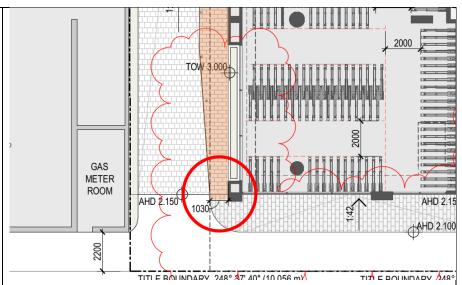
Ground-floor plan showing the cross-block link southern end. The pedestrian footpath is highlighted in orange with the pinch point in question outlined in red
